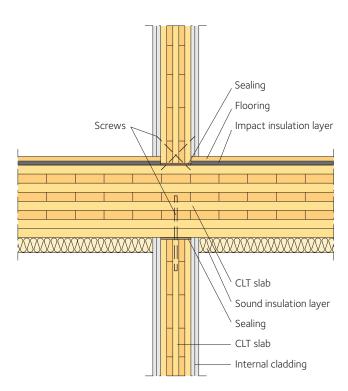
Vertical section for building without higher requirements, premises, regarding sound insulation. Joint flooring to bearing inner wall.
